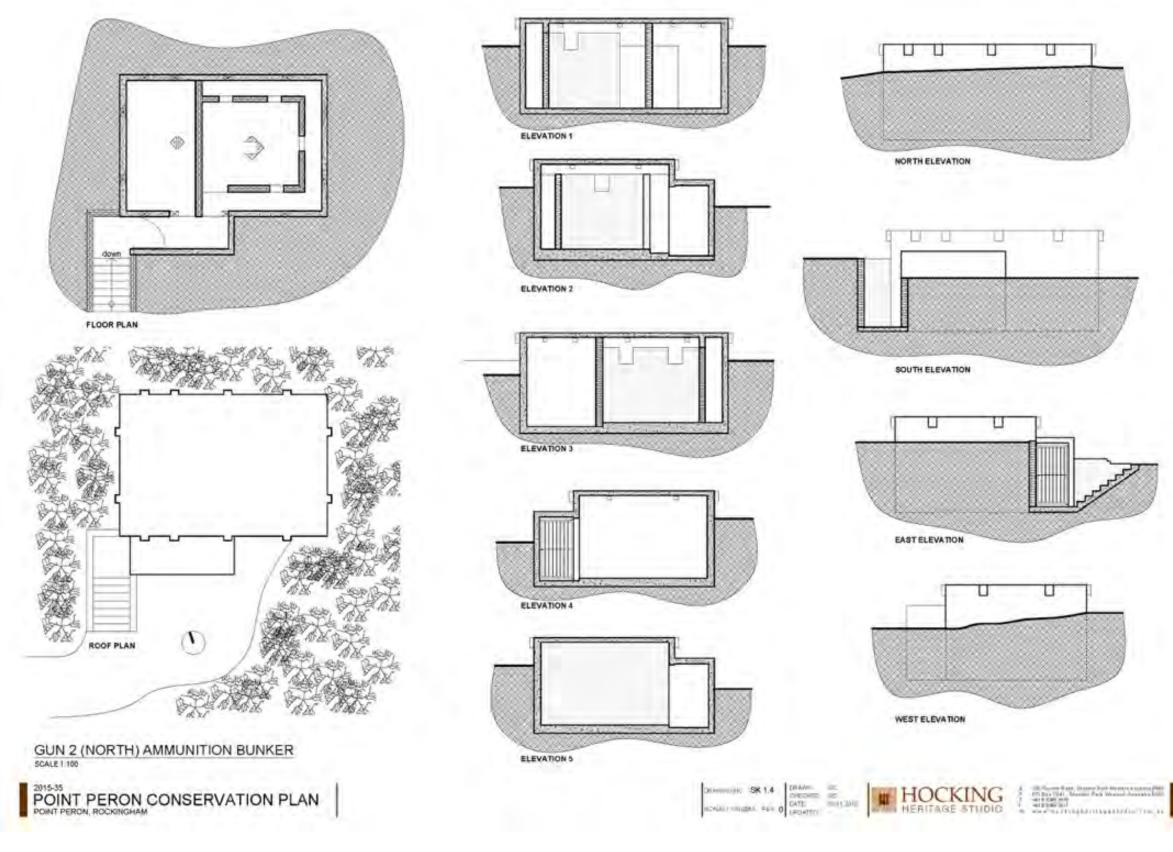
Ammunition Bunker No. 2 – Plans and Elevations
